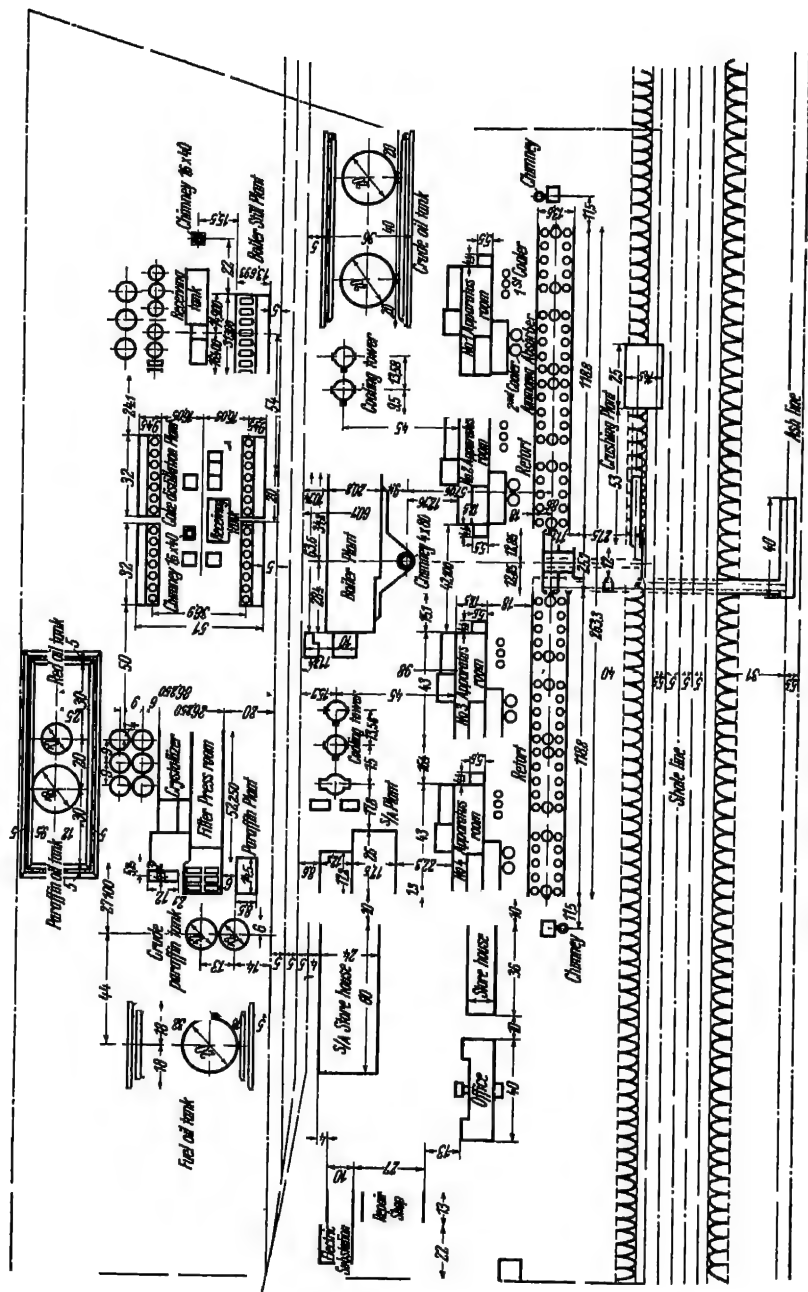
Ground Elevation of the Fushun Oil Shale Plant
